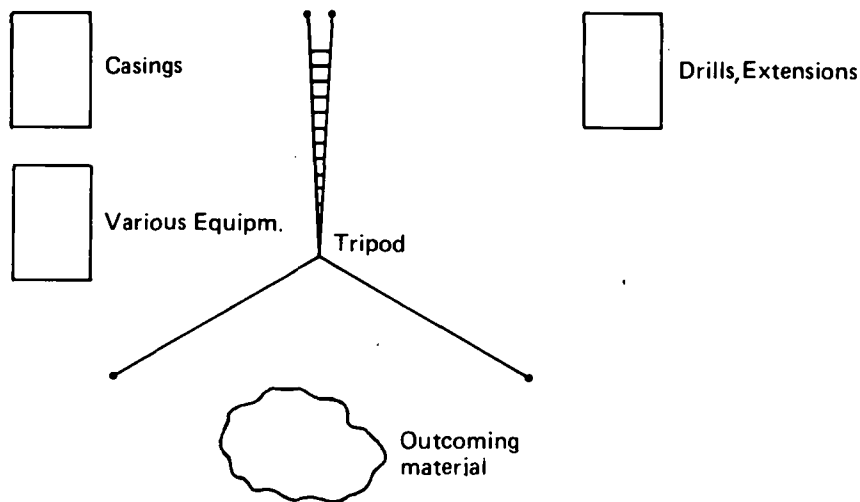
PLAN OF A CONSTRUCTION SITE
